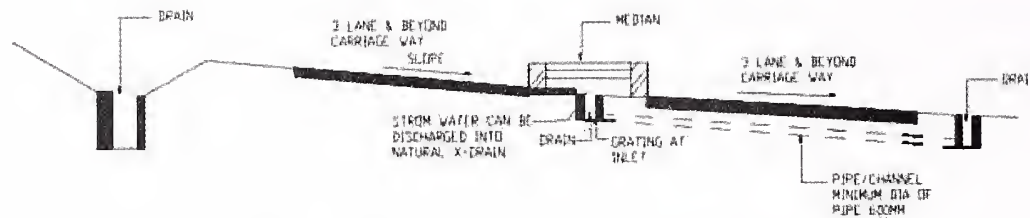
(c) Drainage Arrangement at Medians for Three Lane and Beyond on each Carriageway
